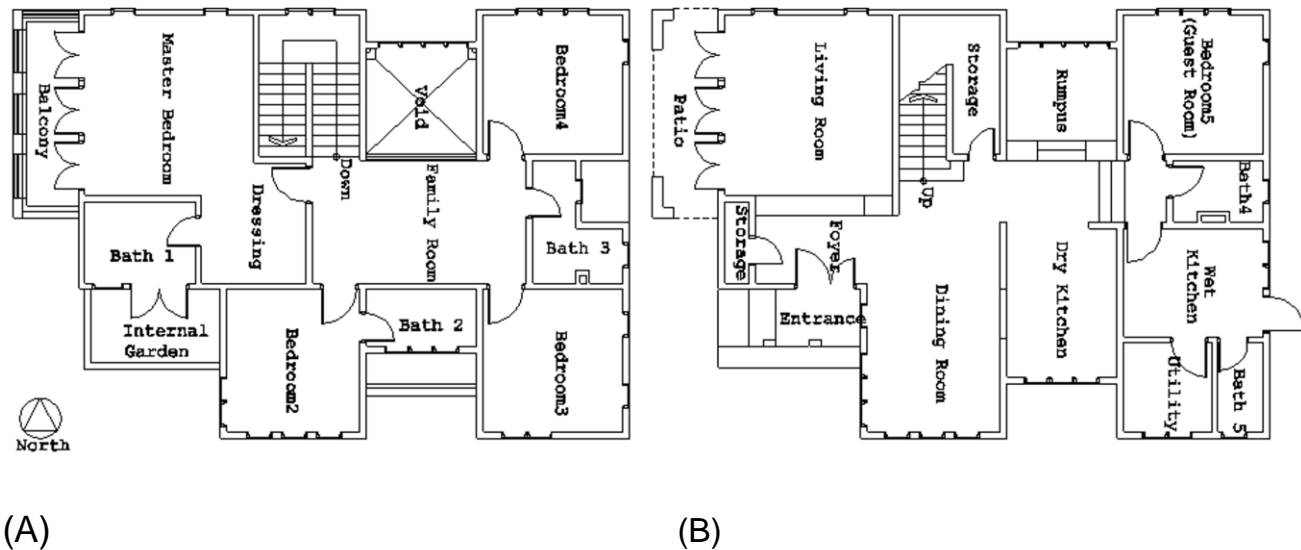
Architecture plans of bungalow house, first floor (A) ground floor (B)
